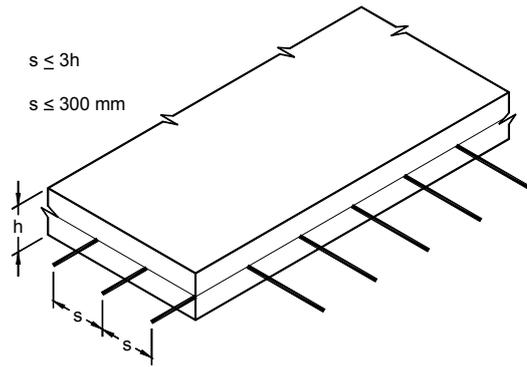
Spacing between shrinkage and temperature reinforcement in slabs
